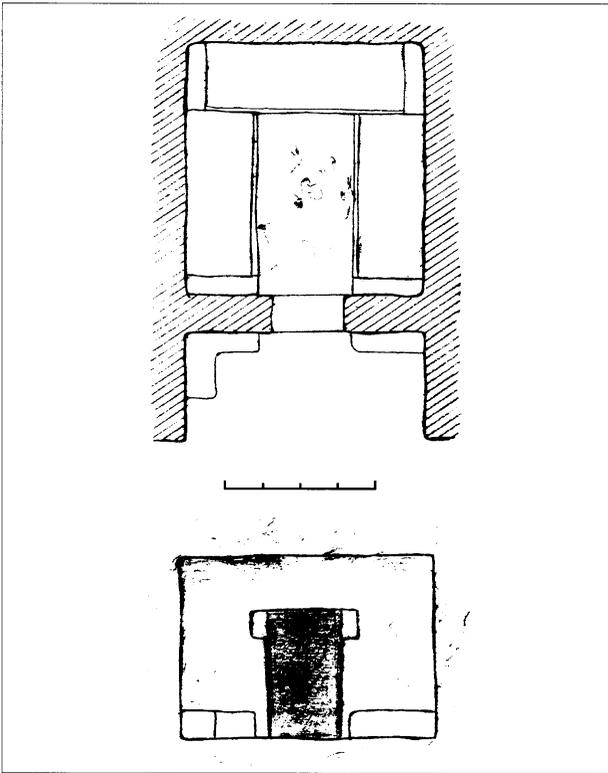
Plan and elevation of tomb 31 (drawn by: N. Çevik, S. Bulut)
